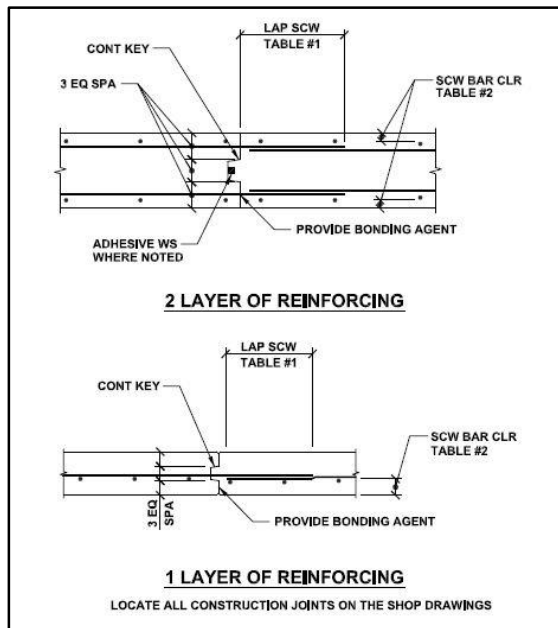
Typical Concrete Wall or Slab Construction Joint
